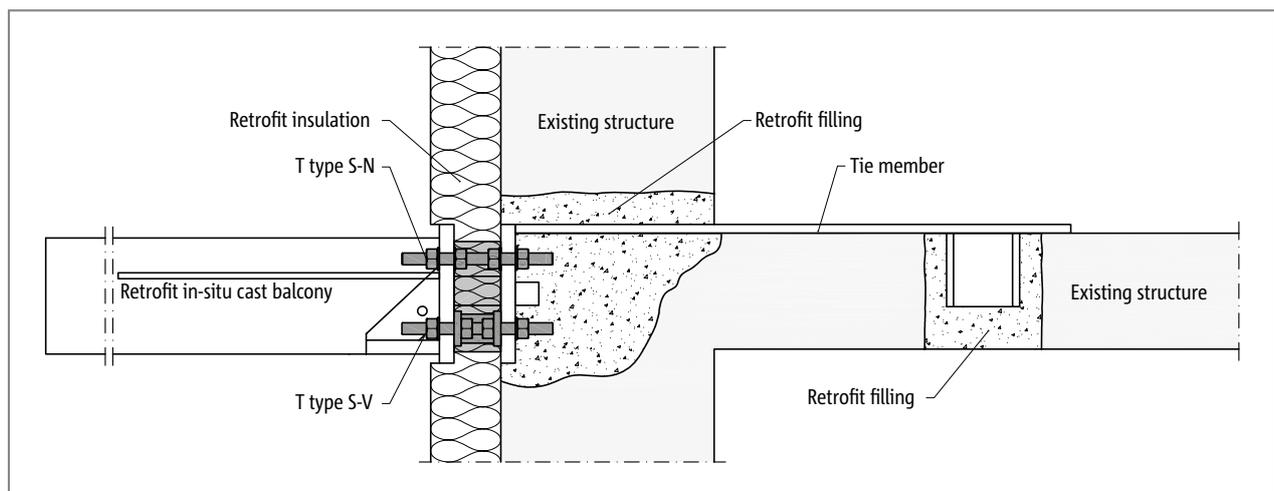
Schöck Isokorb® T type S-N and T type S-V: Retrofitted cantilevered in situ concrete balcony; connected to existing reinforced concrete ceiling with tie member
